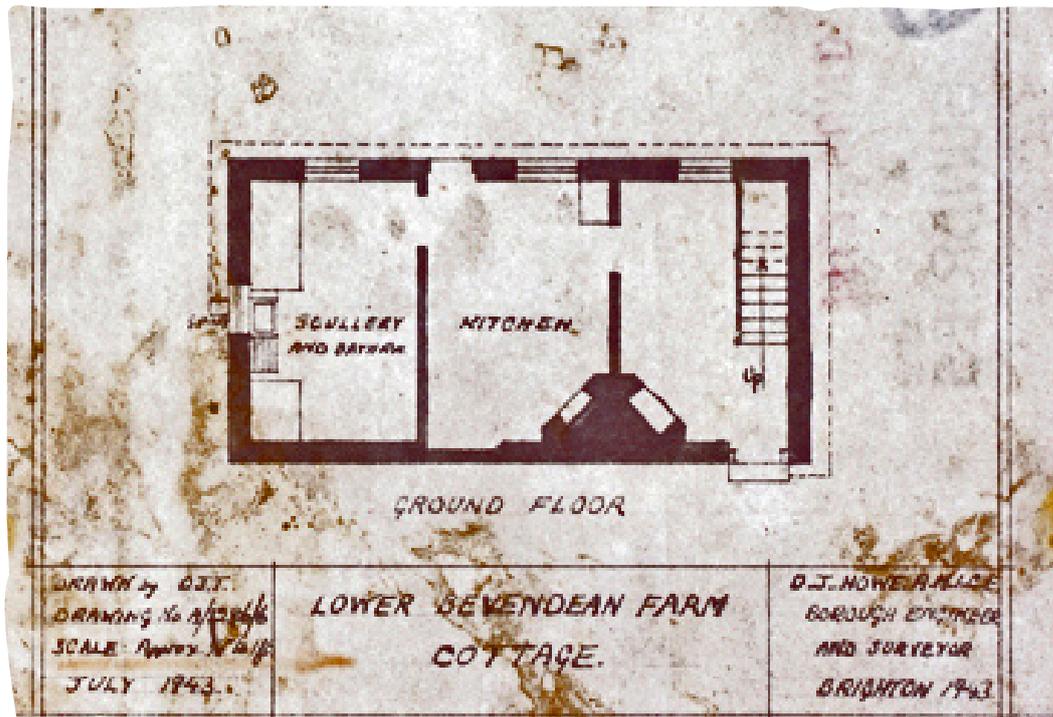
1943 plan of Carter's Cottage showing Ground Floor scullery and kitchen. ©East Sussex Records Office (ESRO Ref: DB/D/6/1409)
